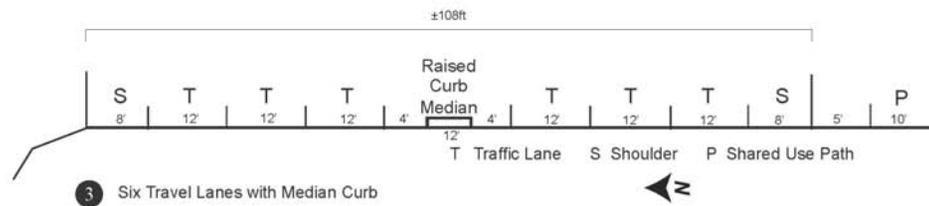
ALTERNATIVE A BETWEEN DOWELL ROAD AND FAIRGROUNDS ROAD
